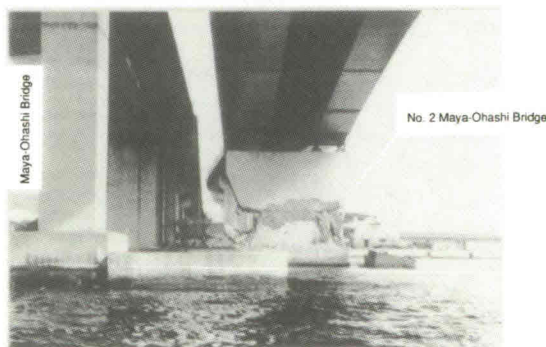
Fractured RC piers of No. 2 Maya-Ohashi Bridge
